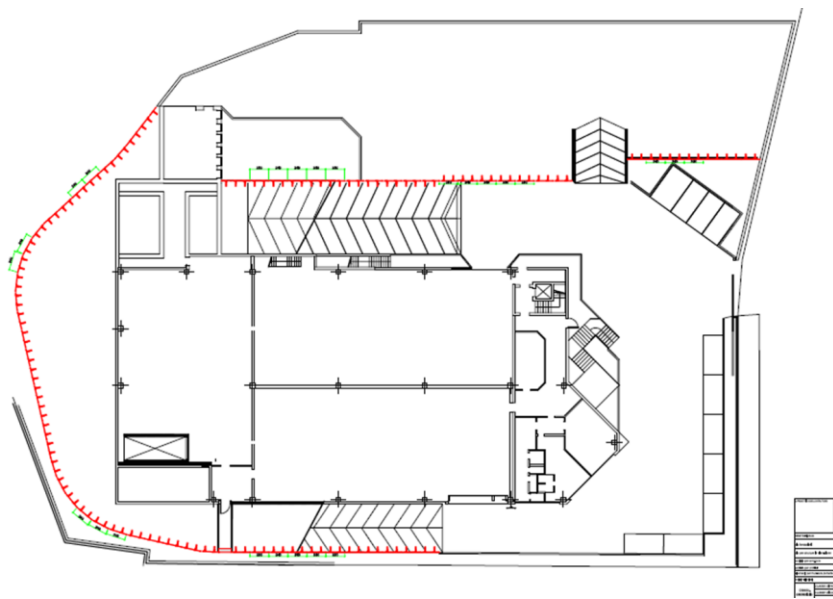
Plan view of the industrial building. / Vista in pianta dell'edificio industriale.
